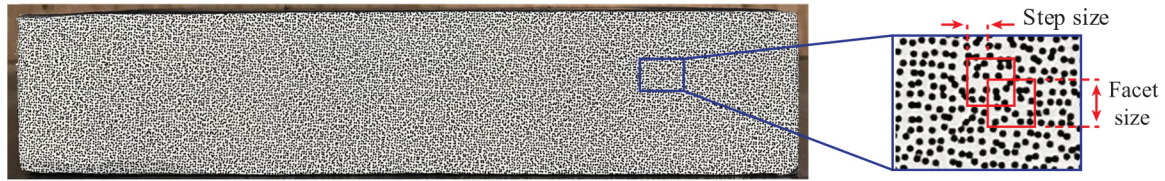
Applied speckle pattern on 40-mm bearing with enlarged view of bearing showing two adjacent facets
